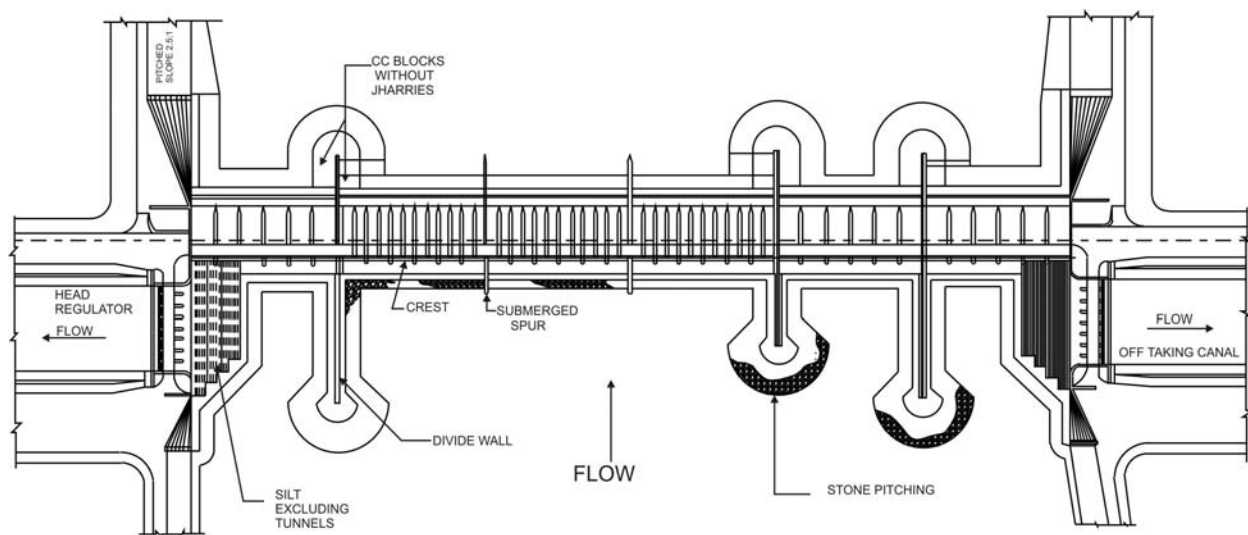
TYPICAL LAYOUT OF A BARRAGE AND ITS APPURTENANT STRUCTURES
